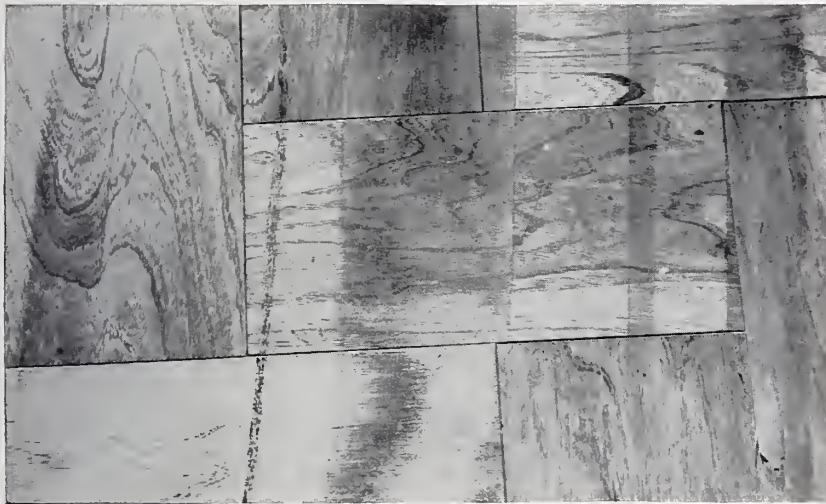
$\frac{1}{2}$ -in. rock-elm plywood tile on concrete subfloor (test panel 17R).
